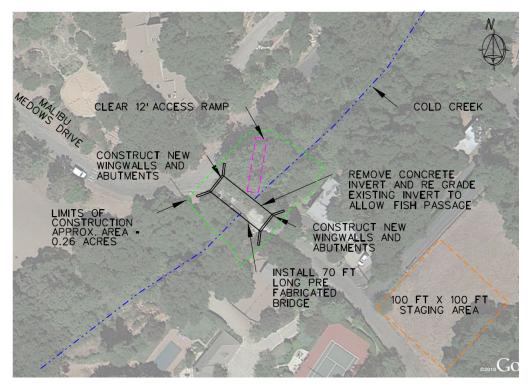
CC2, Malibu Meadows Road Crossing Schematic Design
